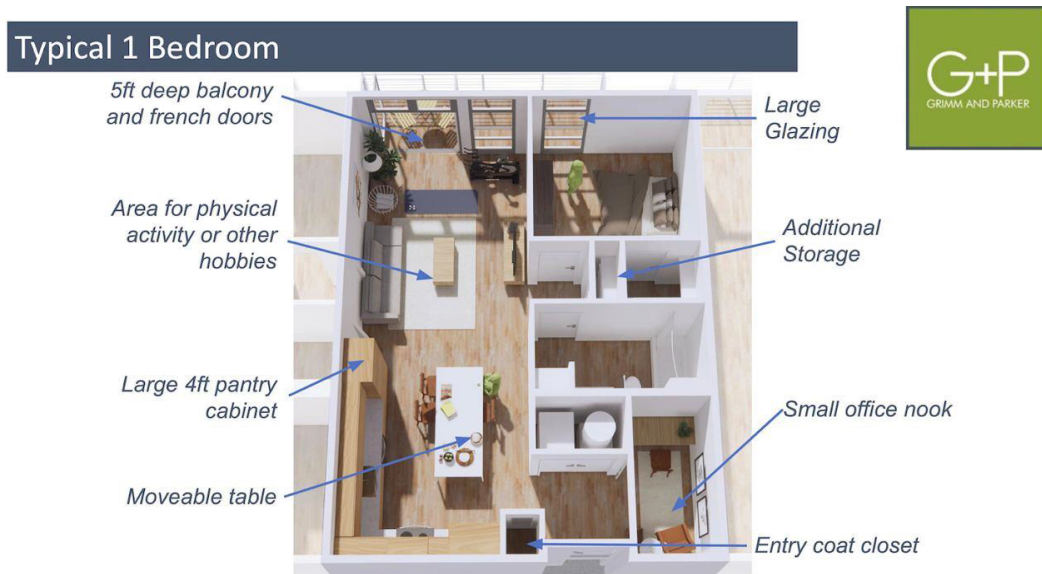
Typical layout of a 1-room apartment – plan by Grimm+Parker, 2021
